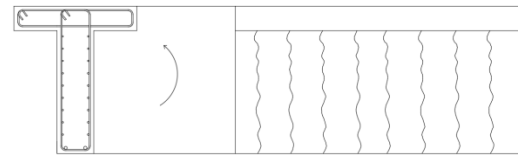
Propagation of cracks in a high beam with reinforcement area in the web.
